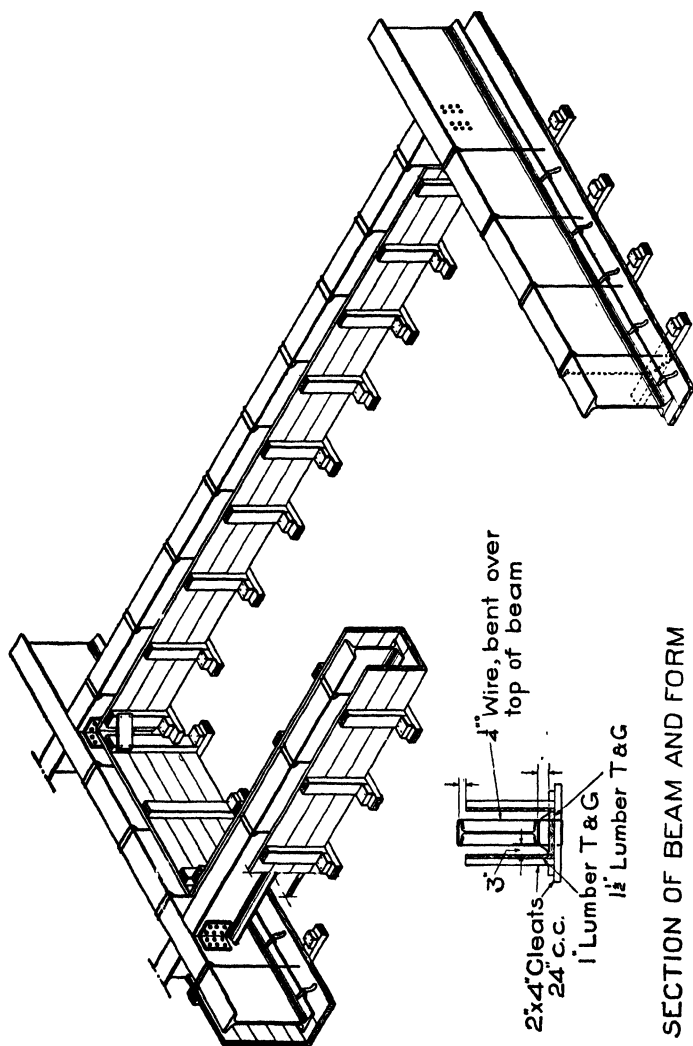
Forms for Fireproofing Steel Beams. (See p. 653.)
